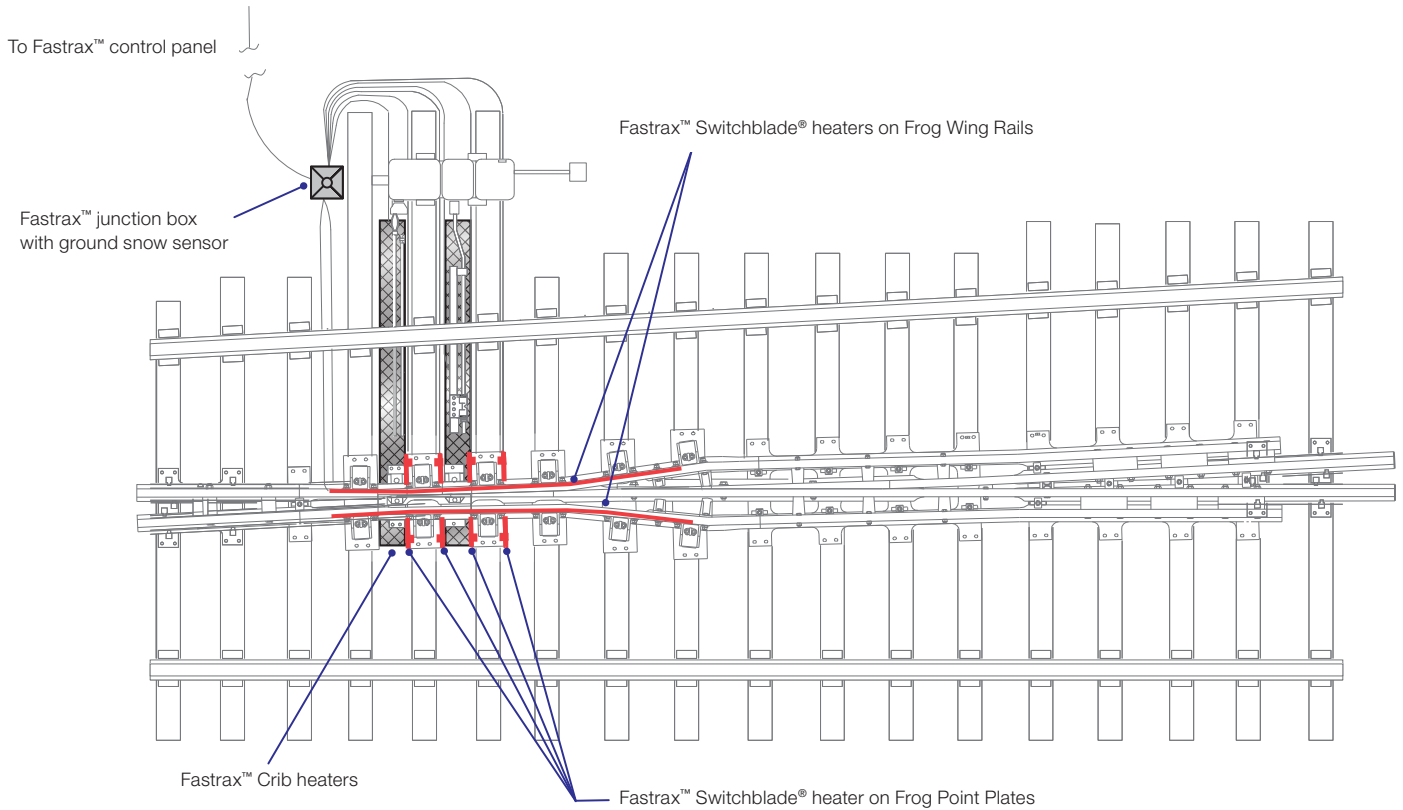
Typical Movable Point Frog Layout - Equipment Detail, No. 20 / 24 Standard Size (All Tie Styles)
